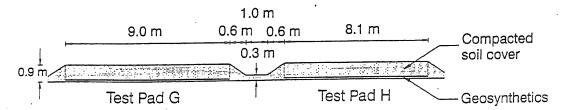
Cross section of Test Pads G and H in the GCL test section.
